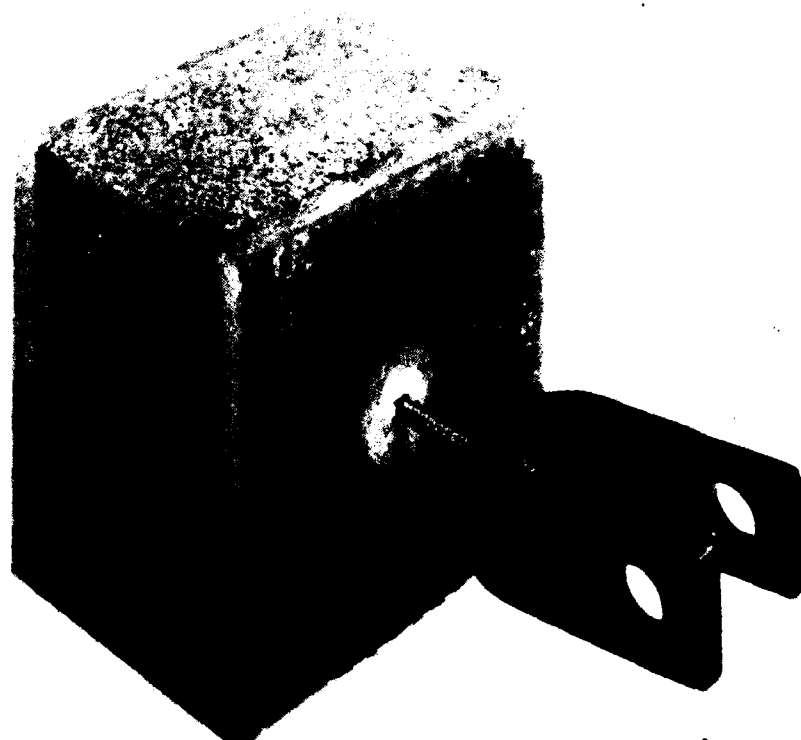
VIEW SHOWING THE TYPICAL FAILURE OF A PULL-OUT SPECIMEN
